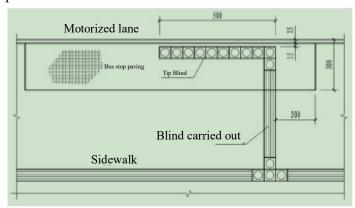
Arrangement diagram of Crossed Warning Blind Sidewalk
